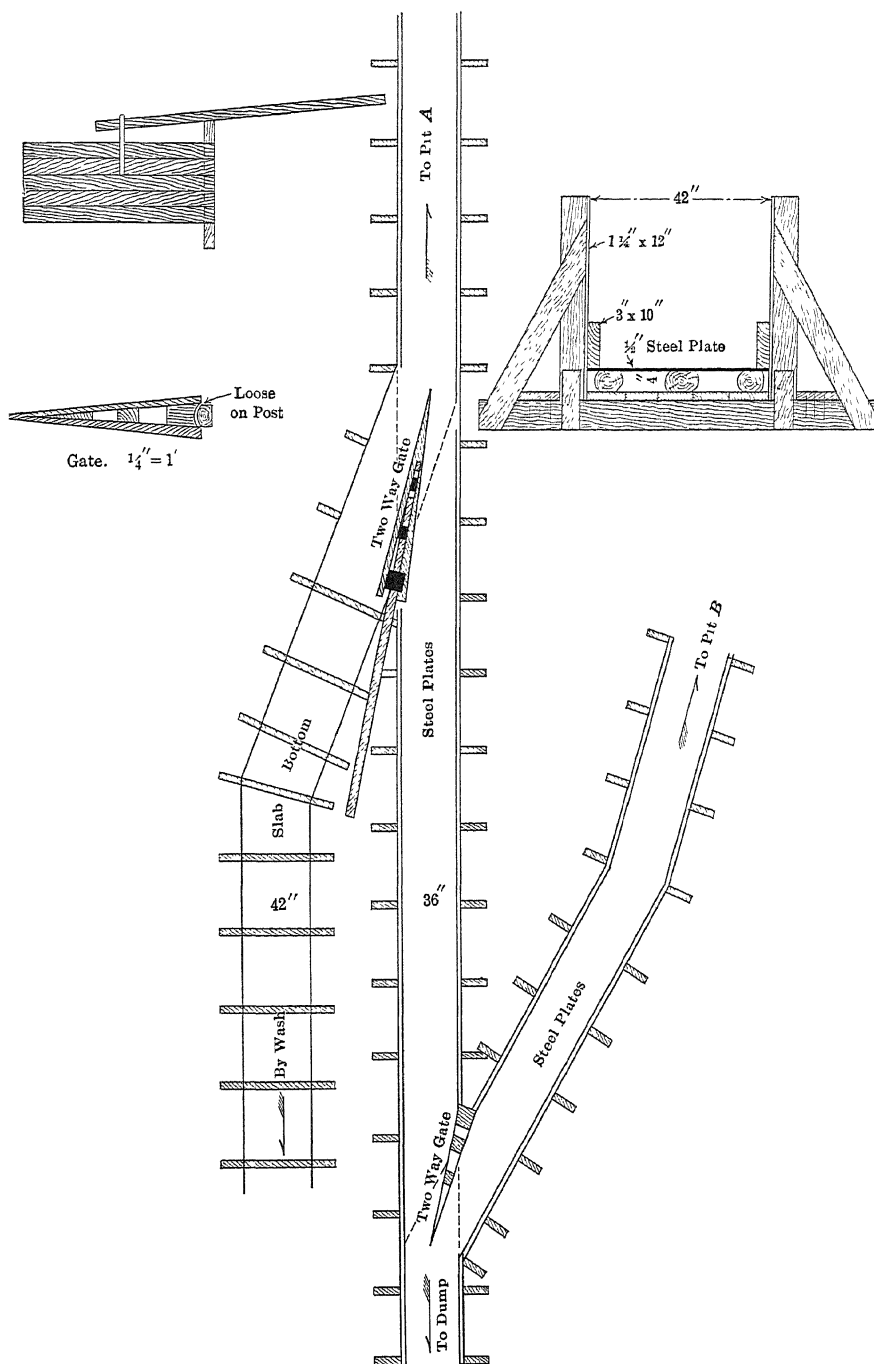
ARRANGEMENT OF SLUICES; DETAILS OF TWO-WAY GATES; AND CROSS-SECTION OF GOLD-SAVING SLUICE.
